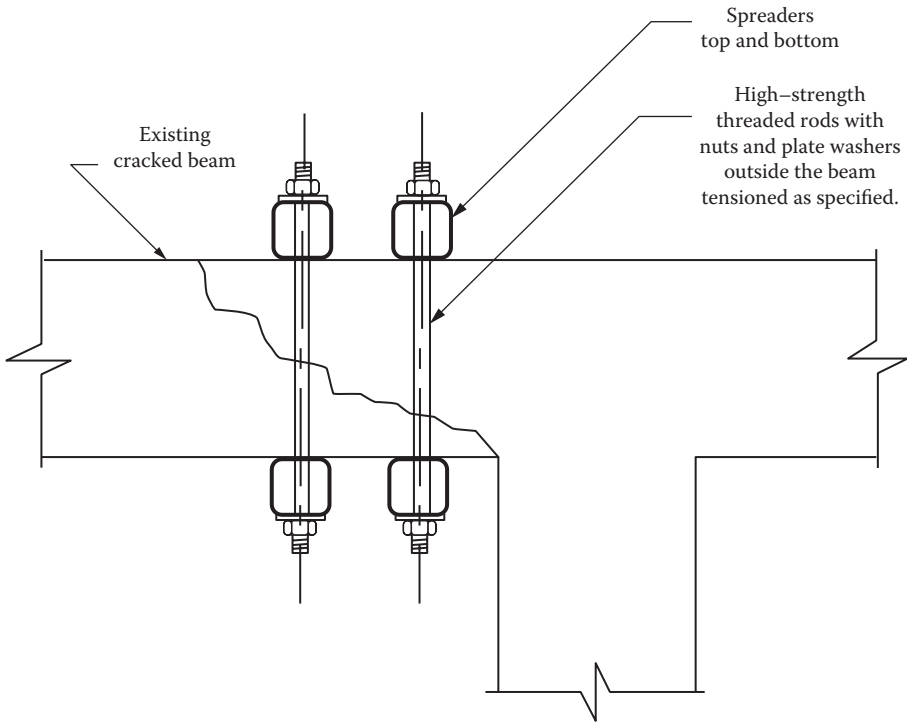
Upgrading the shear capacity of existing concrete beams by through bolting.
